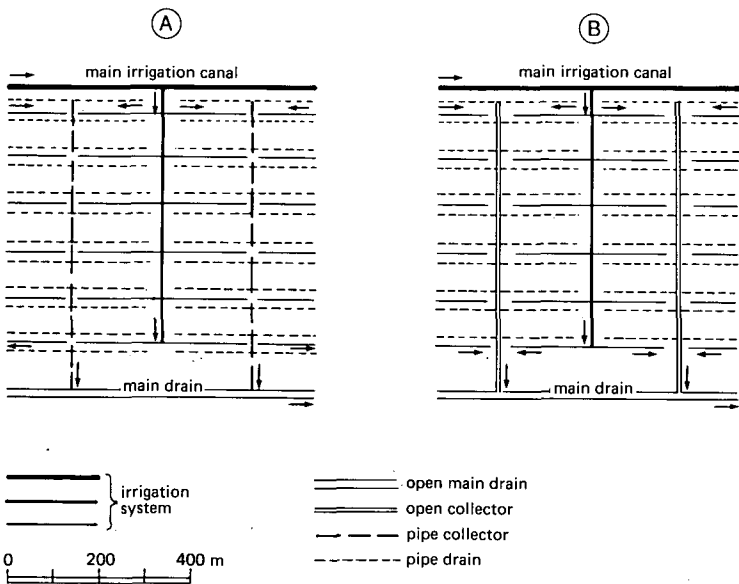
Irrigation and drainage layout in a new land consolidation area
